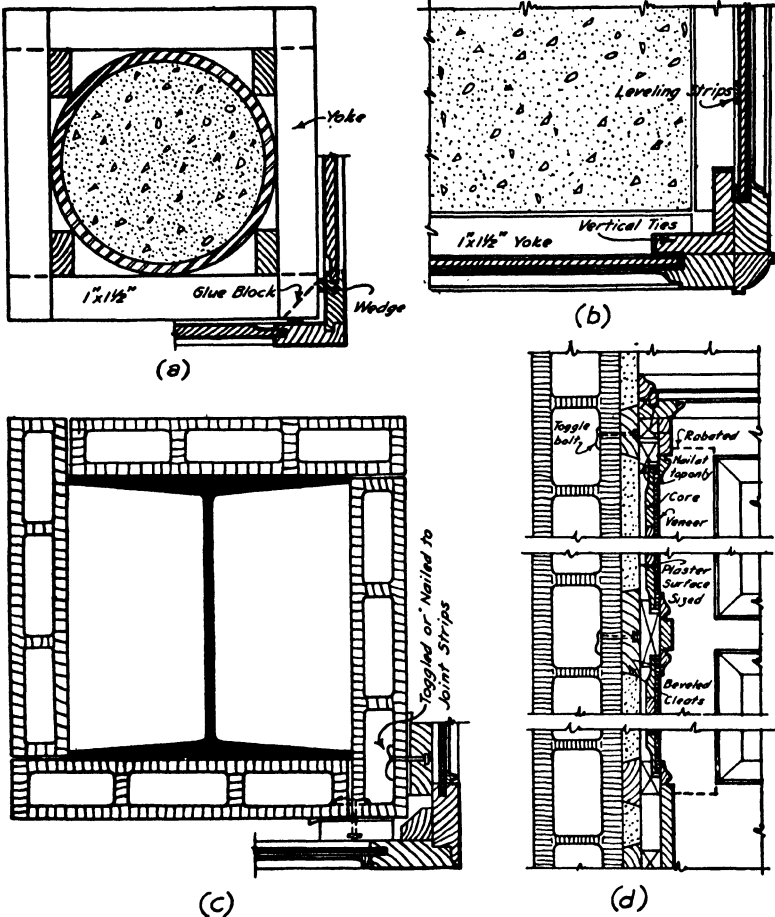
Wood Paneling at Walls and Columns. (a) furring around cement-filled pipe column; (b) furring around concrete column; (c) furring around fireproof steel; (d) furring for dado.
